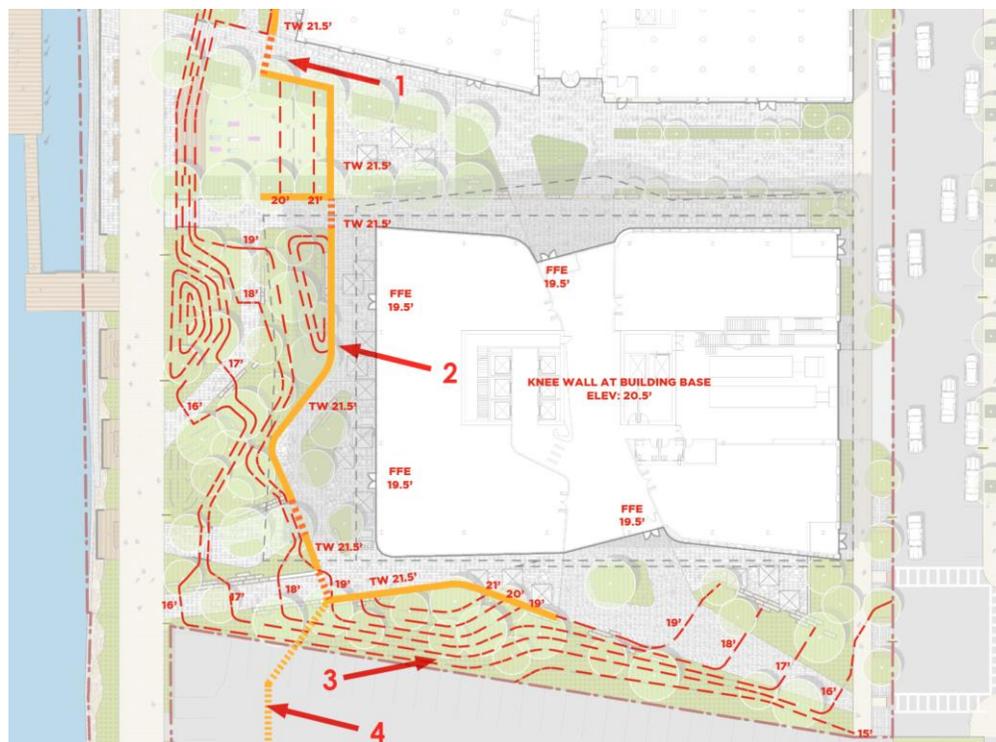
15 Necco Resiliency Planning. Image identifies grade changes and BCB elevation grades for flood protection. This plan was later adapted to a Finished Floor Elevation of 21.5'+ BCB.⁹¹
